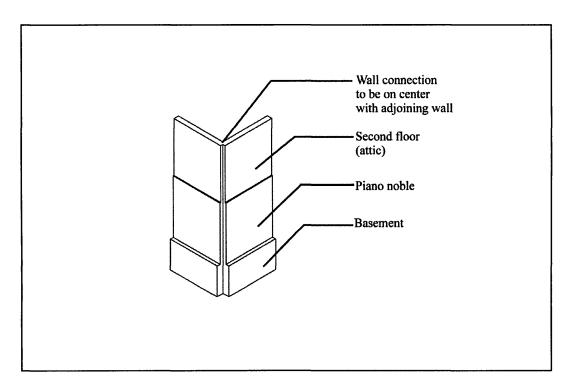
Wall section of adjoining walls - center of wall to center of wall
